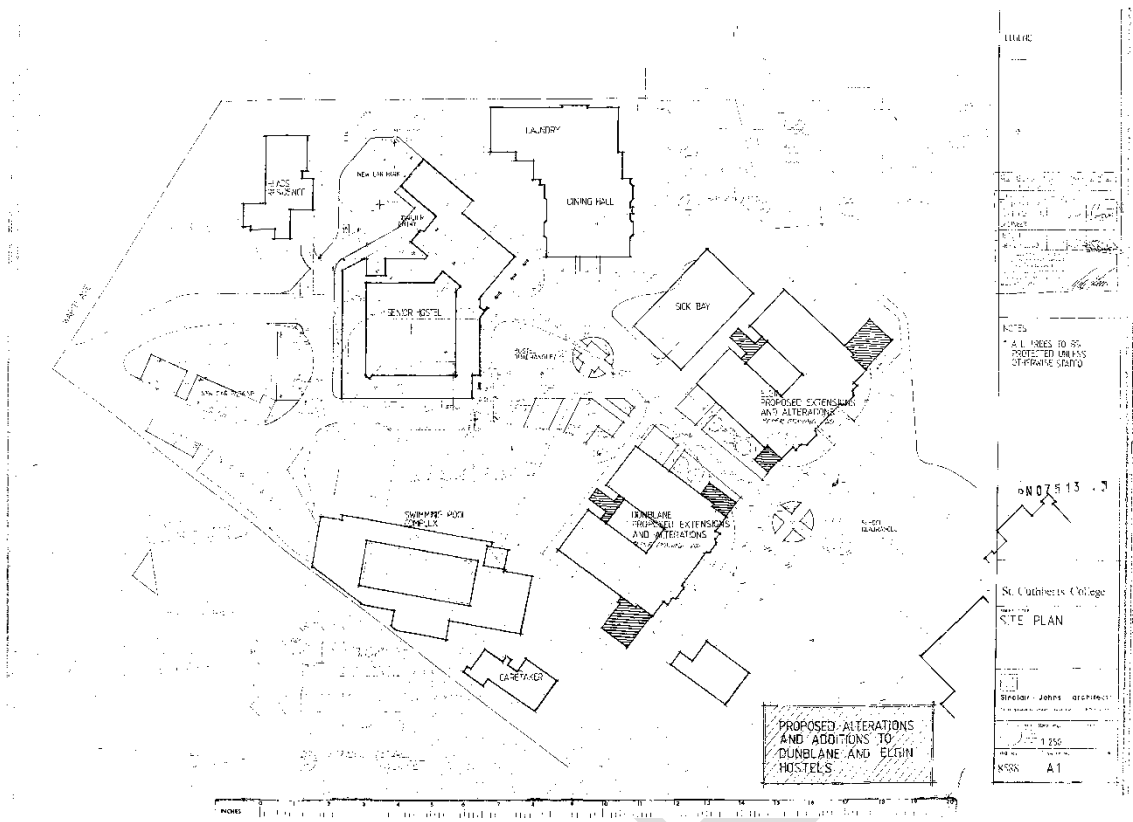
Plan showing additions to Dunblane House and Elgin House in 1986 (Auckland Council property records).
